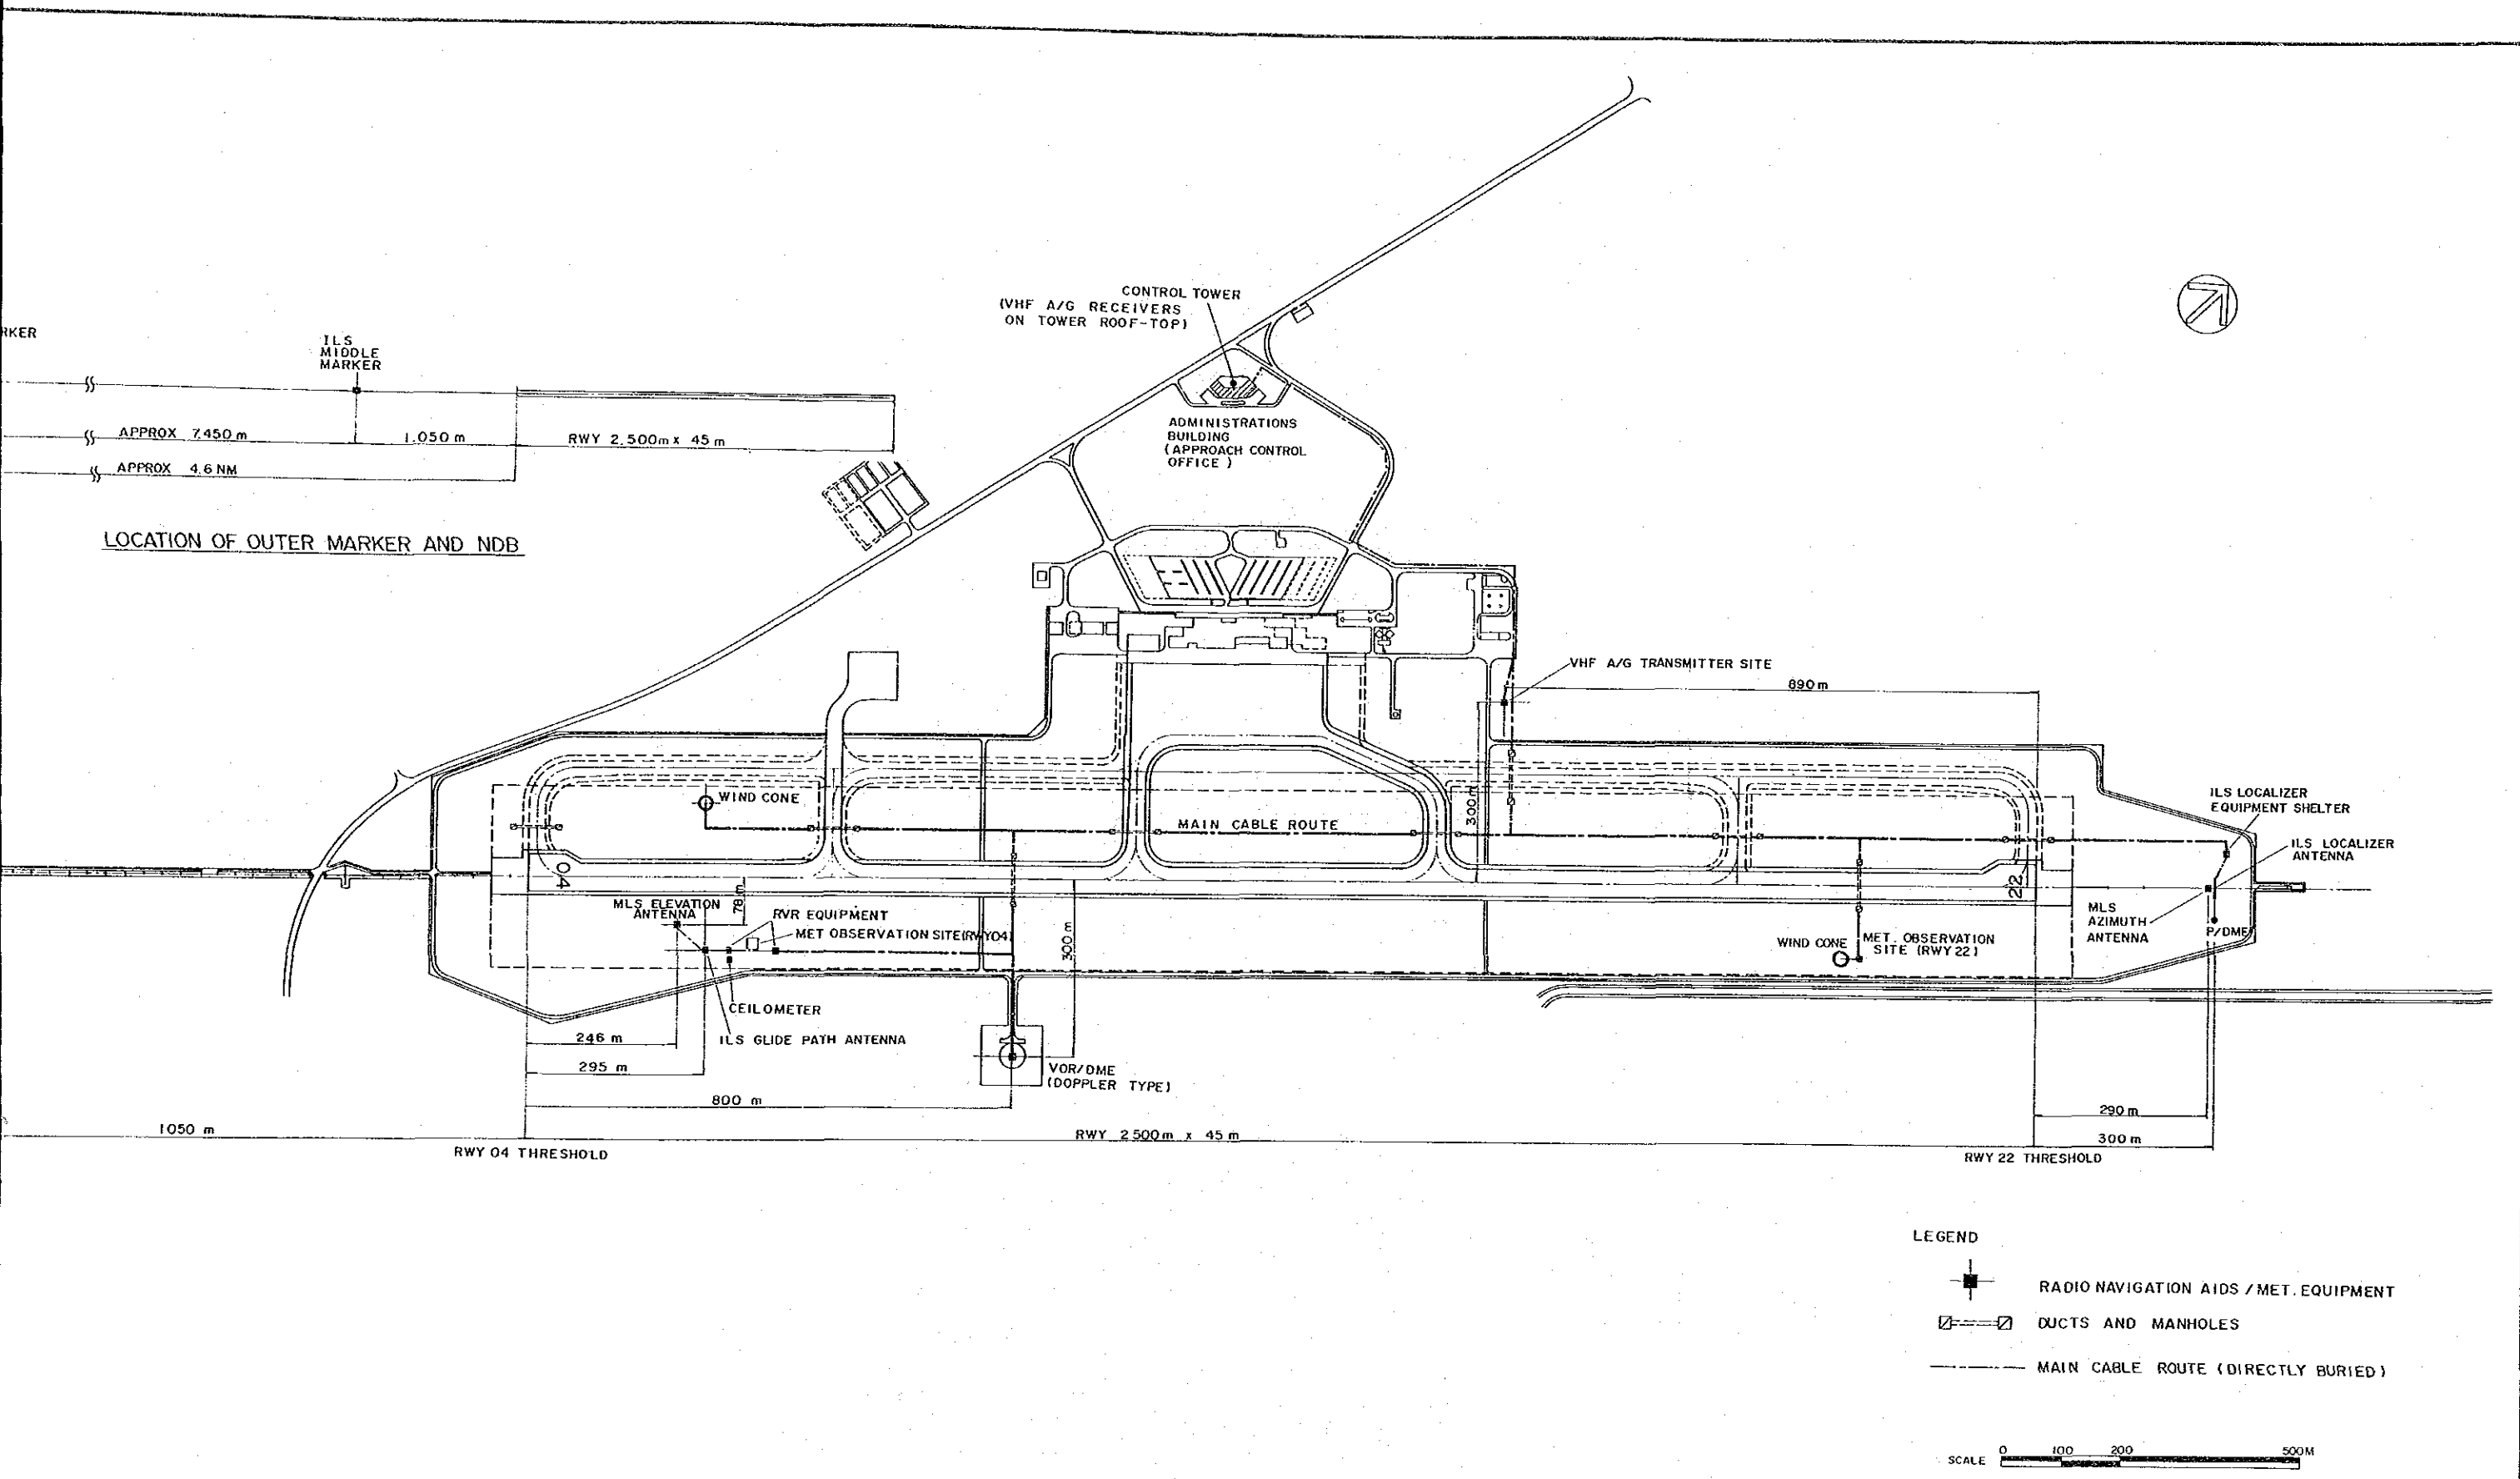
Nav aids Layout Plan (Phase-I)
